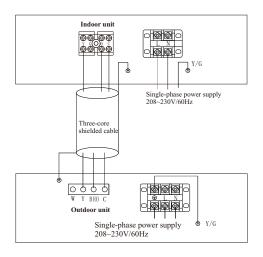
Electrical Wiring of Single-phase HP Outdoor Units
